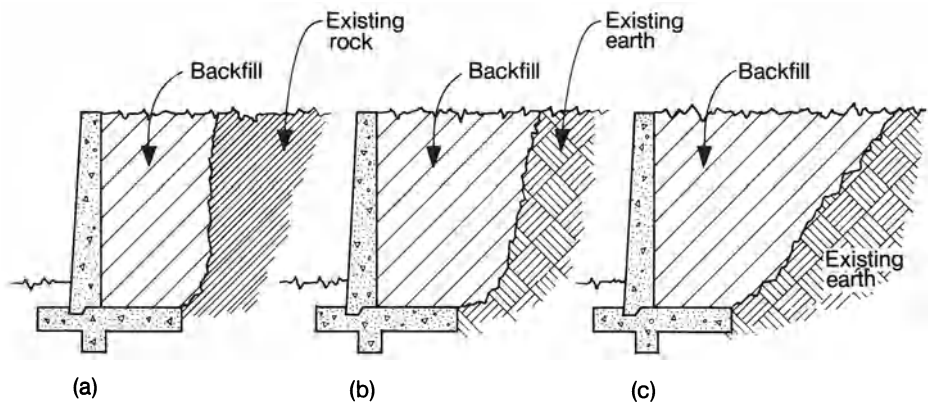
Source of lateral pressure on a retaining wall.
